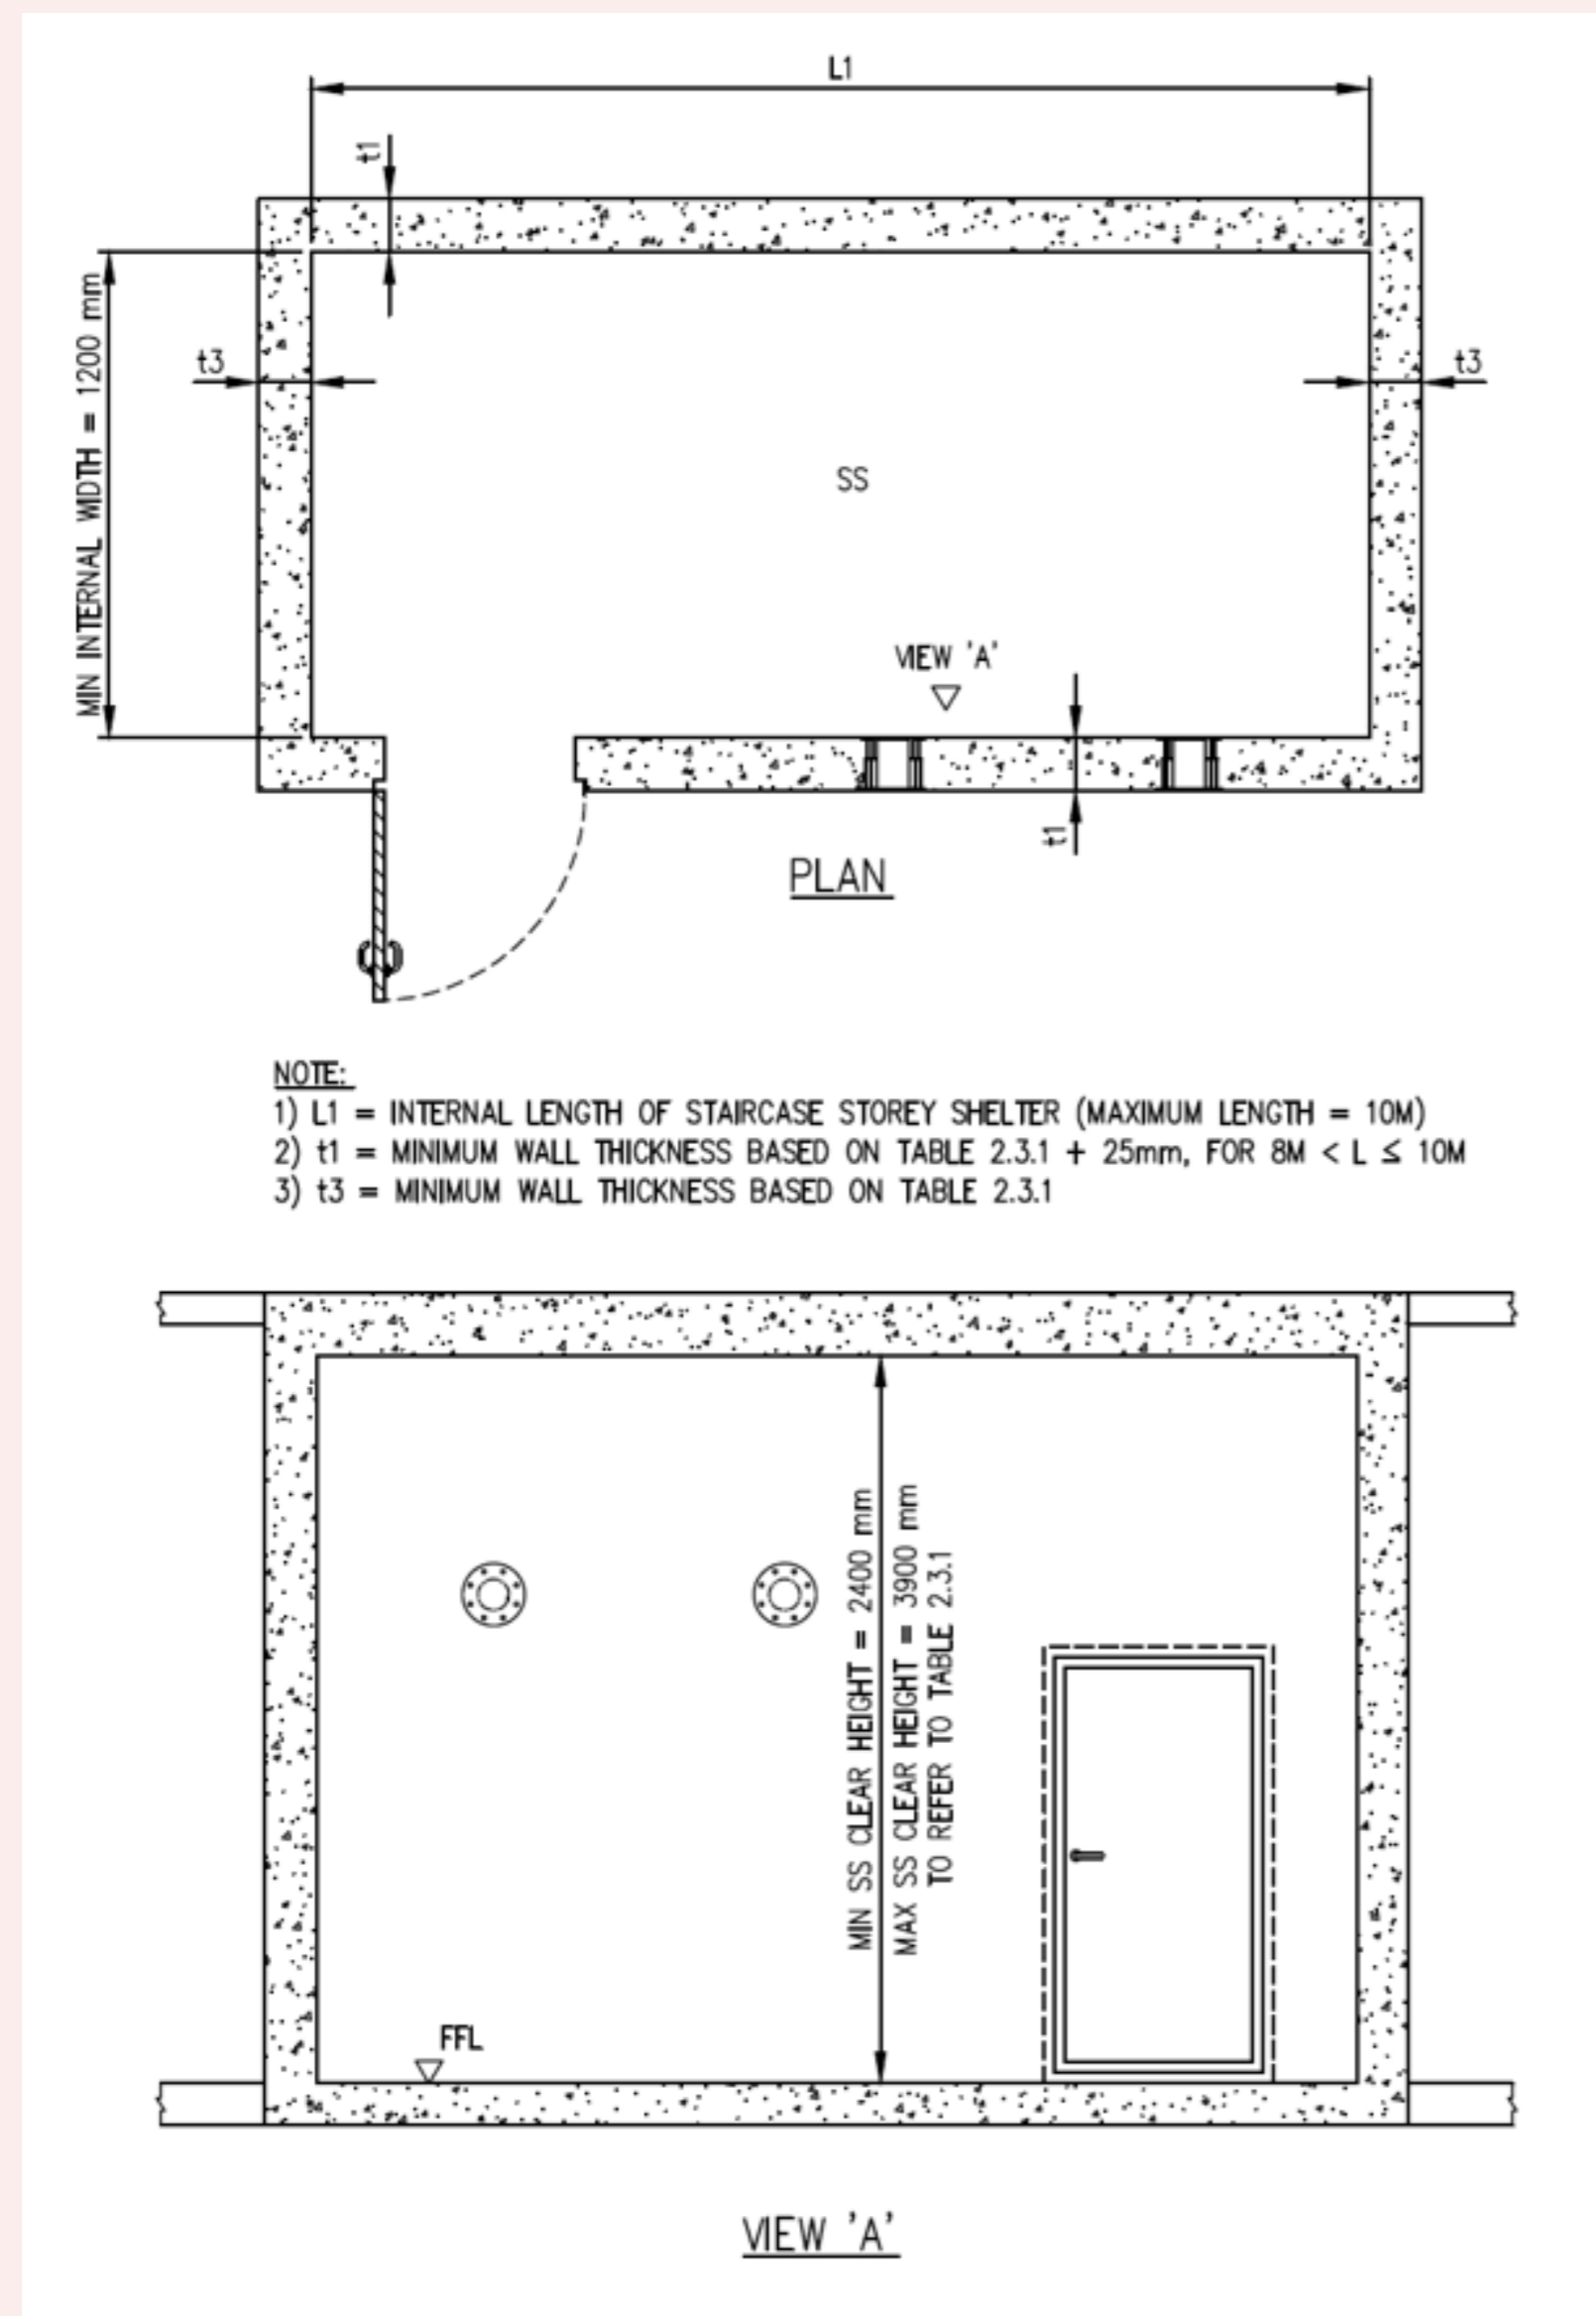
(b): TYPICAL LAYOUT OF S/C SS
